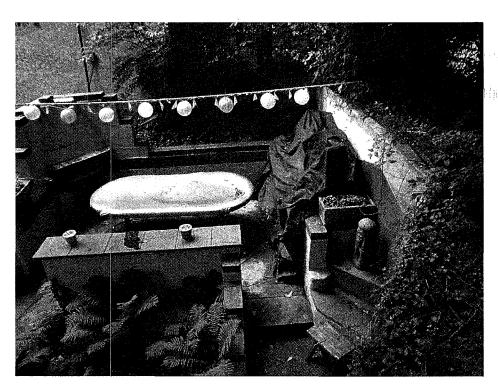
Retaining wall built into landward side of levee near home (Station 42+00)
